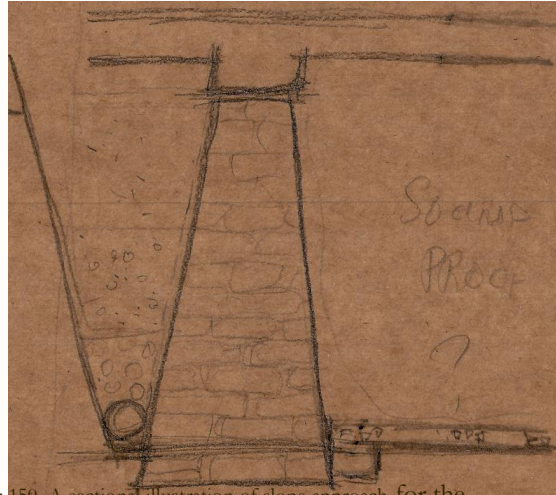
A sectional illustration of slope approach for the building (Author, 2023)
